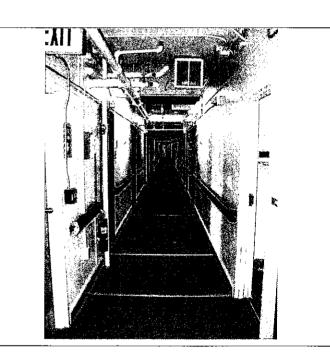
04/28/05 - Sanders Building (Building #3): Tunnel connecting to Maple Hill.
